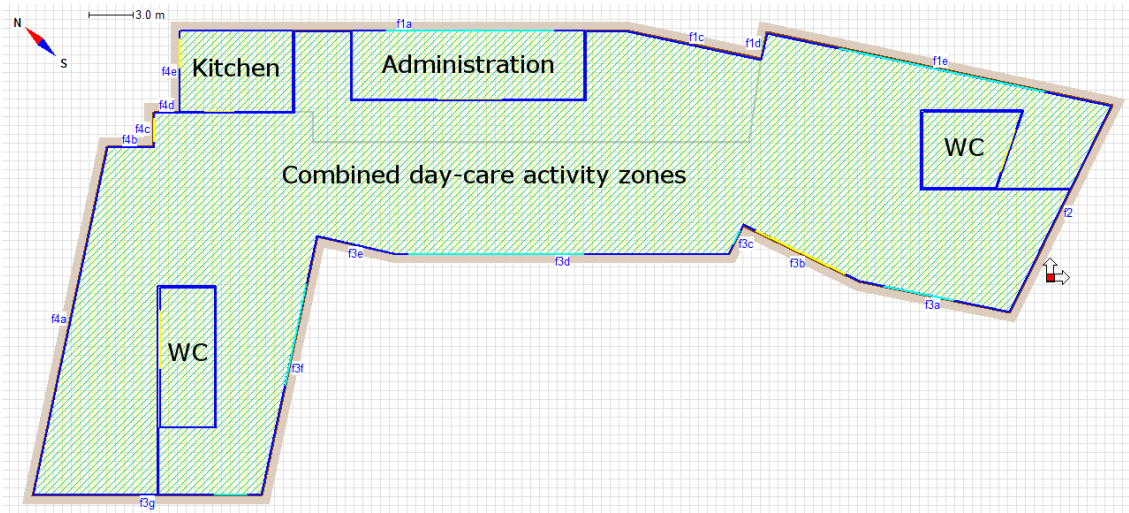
Floor plan of Luhtaa modified IDA ICE building model, with simplified zone division, ground level. The building also has a basement space.
